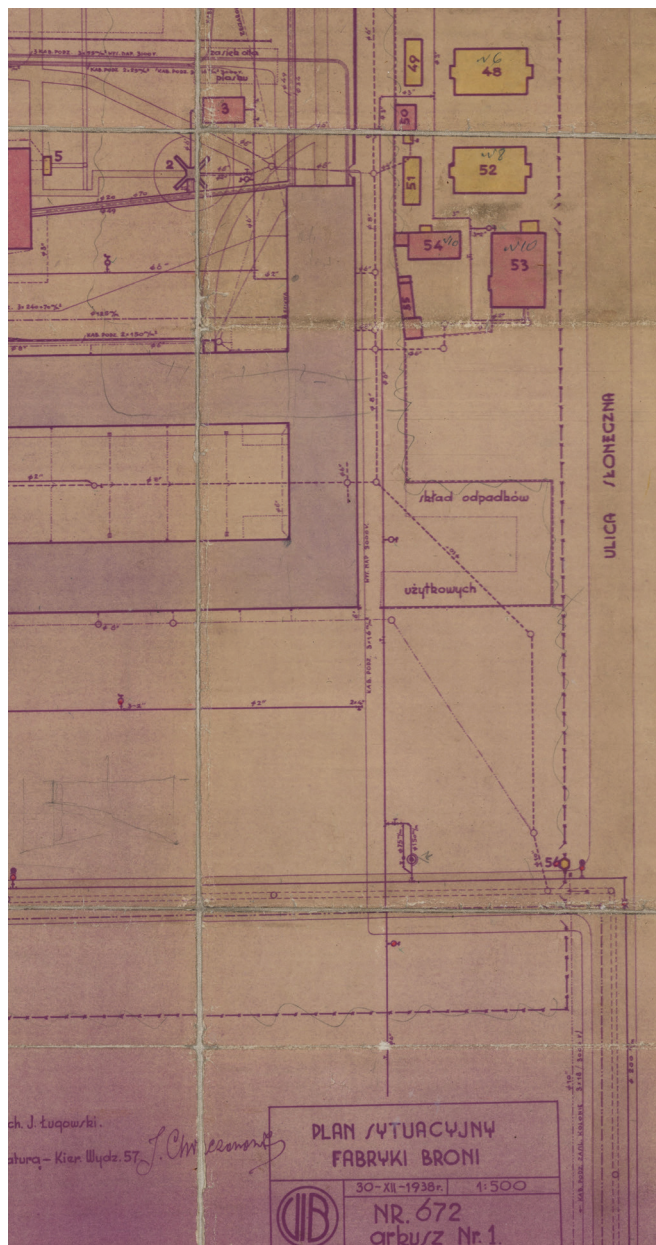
Location of the buildings at 6, 8, and 10 Słoneczna Street on the 1938 Armament Factory plan
